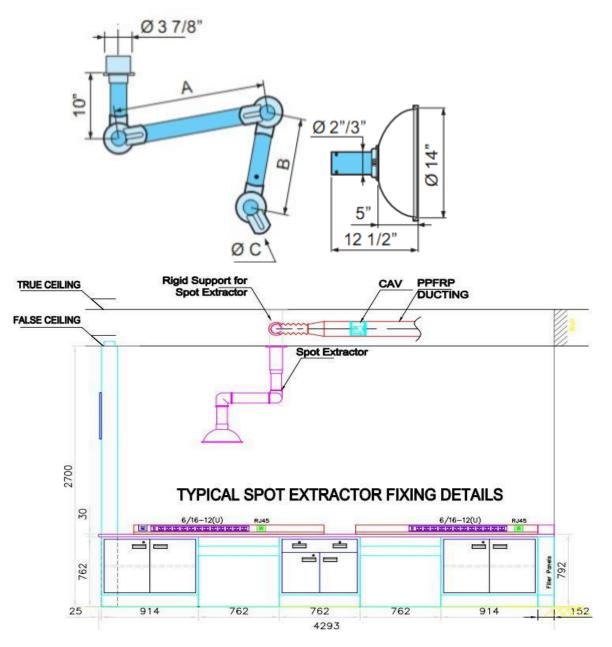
TYPICAL SPOT EXTRACTOR FIXING DETAILS
